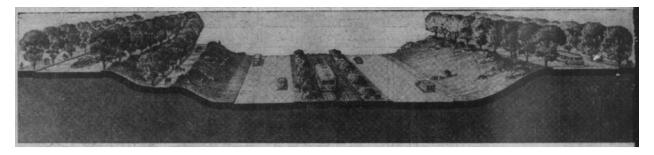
The 1945 City of Detroit proposed highway plan had this lateral cutout to show lanes, green space, embankments, and transit. Detroit Free Press, 28 February 1948
